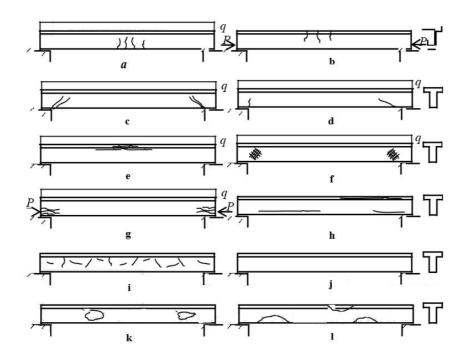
Schemes of possible damage in reinforced concrete beams:
